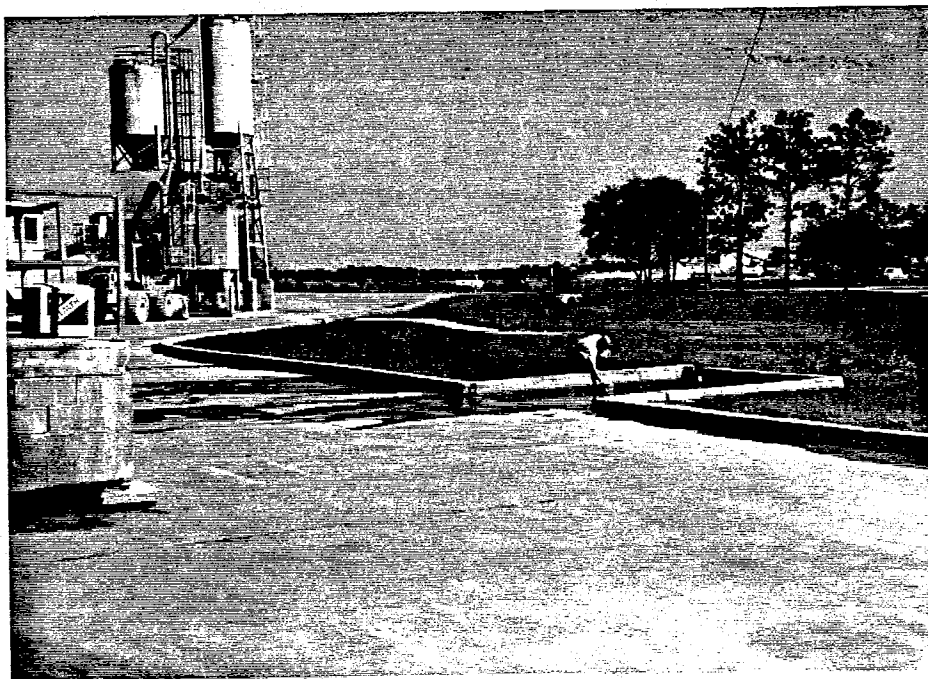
Taking a Type I wastewater sample from the Florida Rock ready-mixed concrete plant in Clermont, FL.
